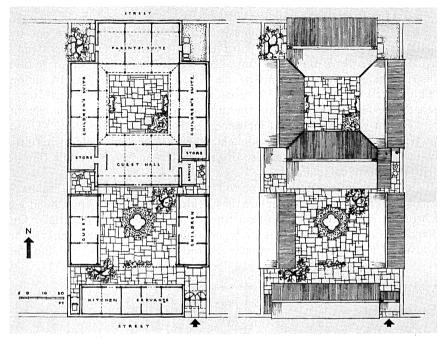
Sì-hé-yuàn: plan and roof plan of a typical Beijing house (after Boyd, 1962, pages 80-81).
